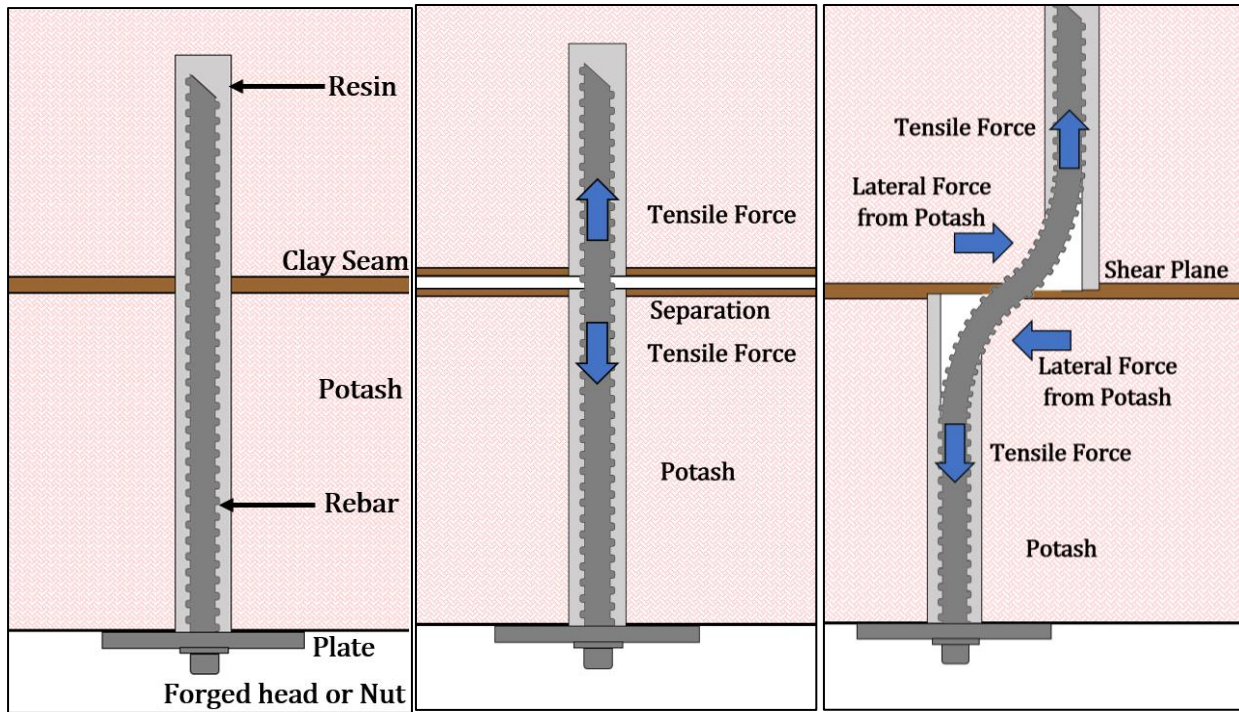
Components of fully-encapsulated resin grouted rebar (left), rebar loading during separation of potash layers (centre), and rebar loading during shear movement across potash layers (right)
